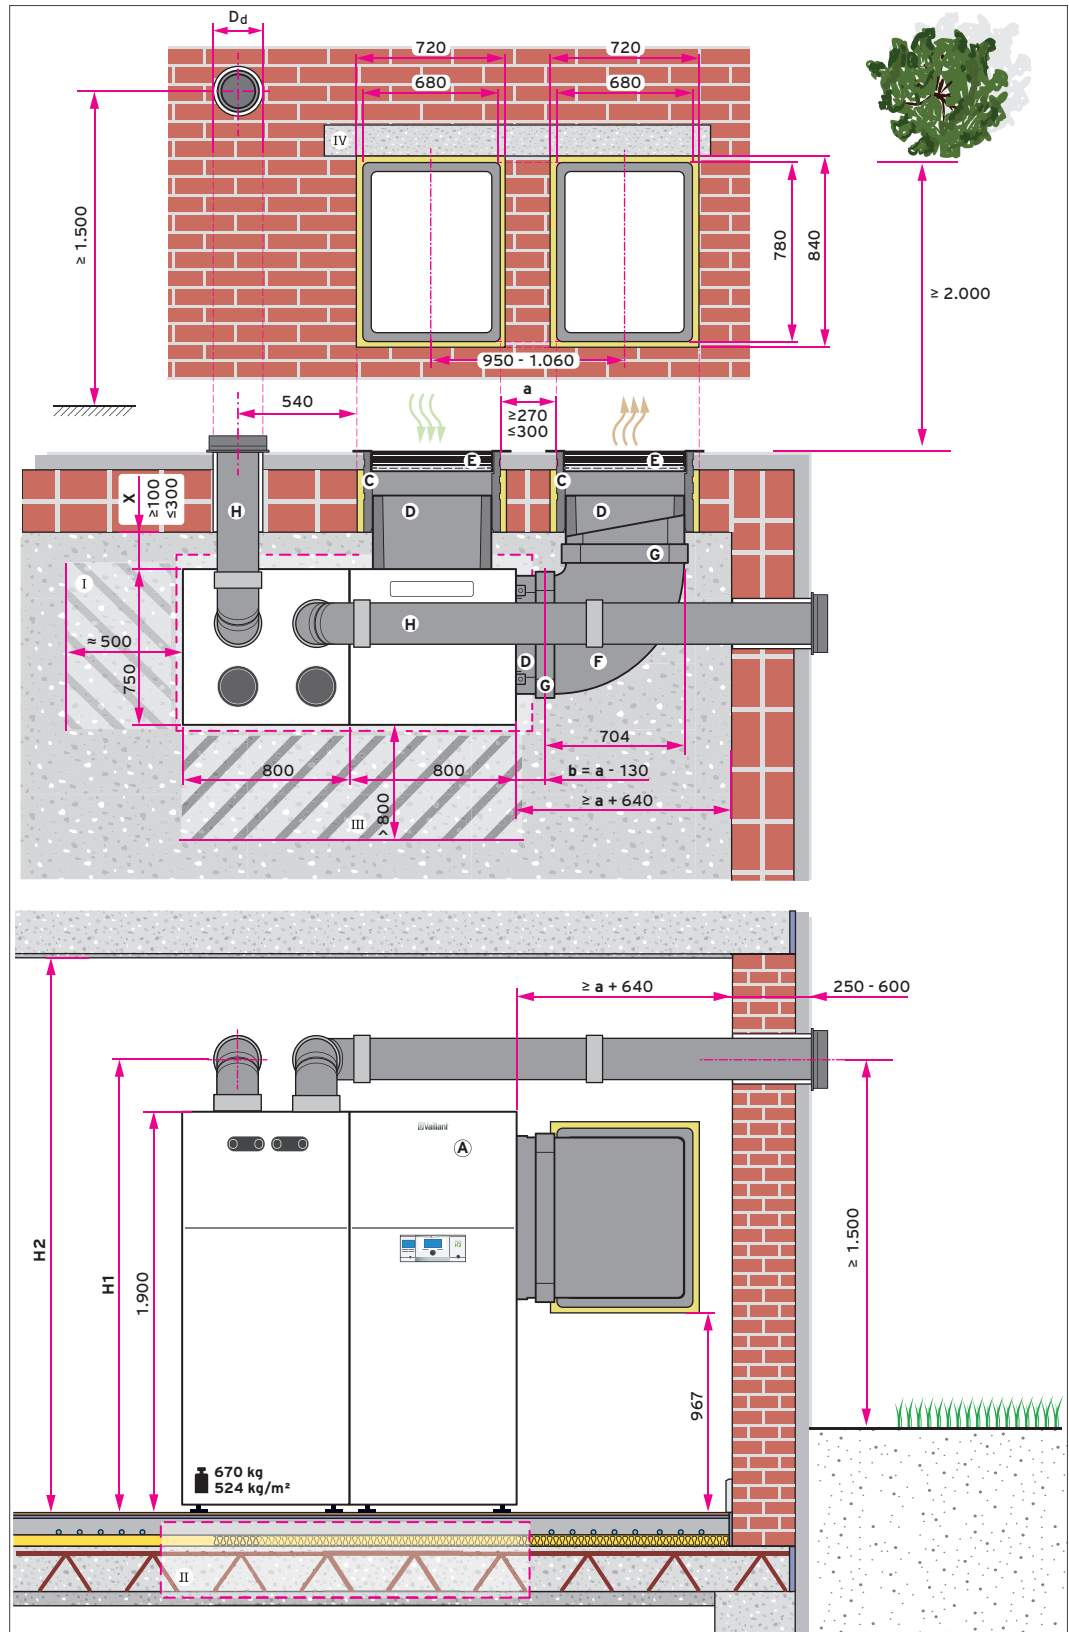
recoCOMPACT installation situation, ground floor with heat production source (fireplace) - air intake at the rear
